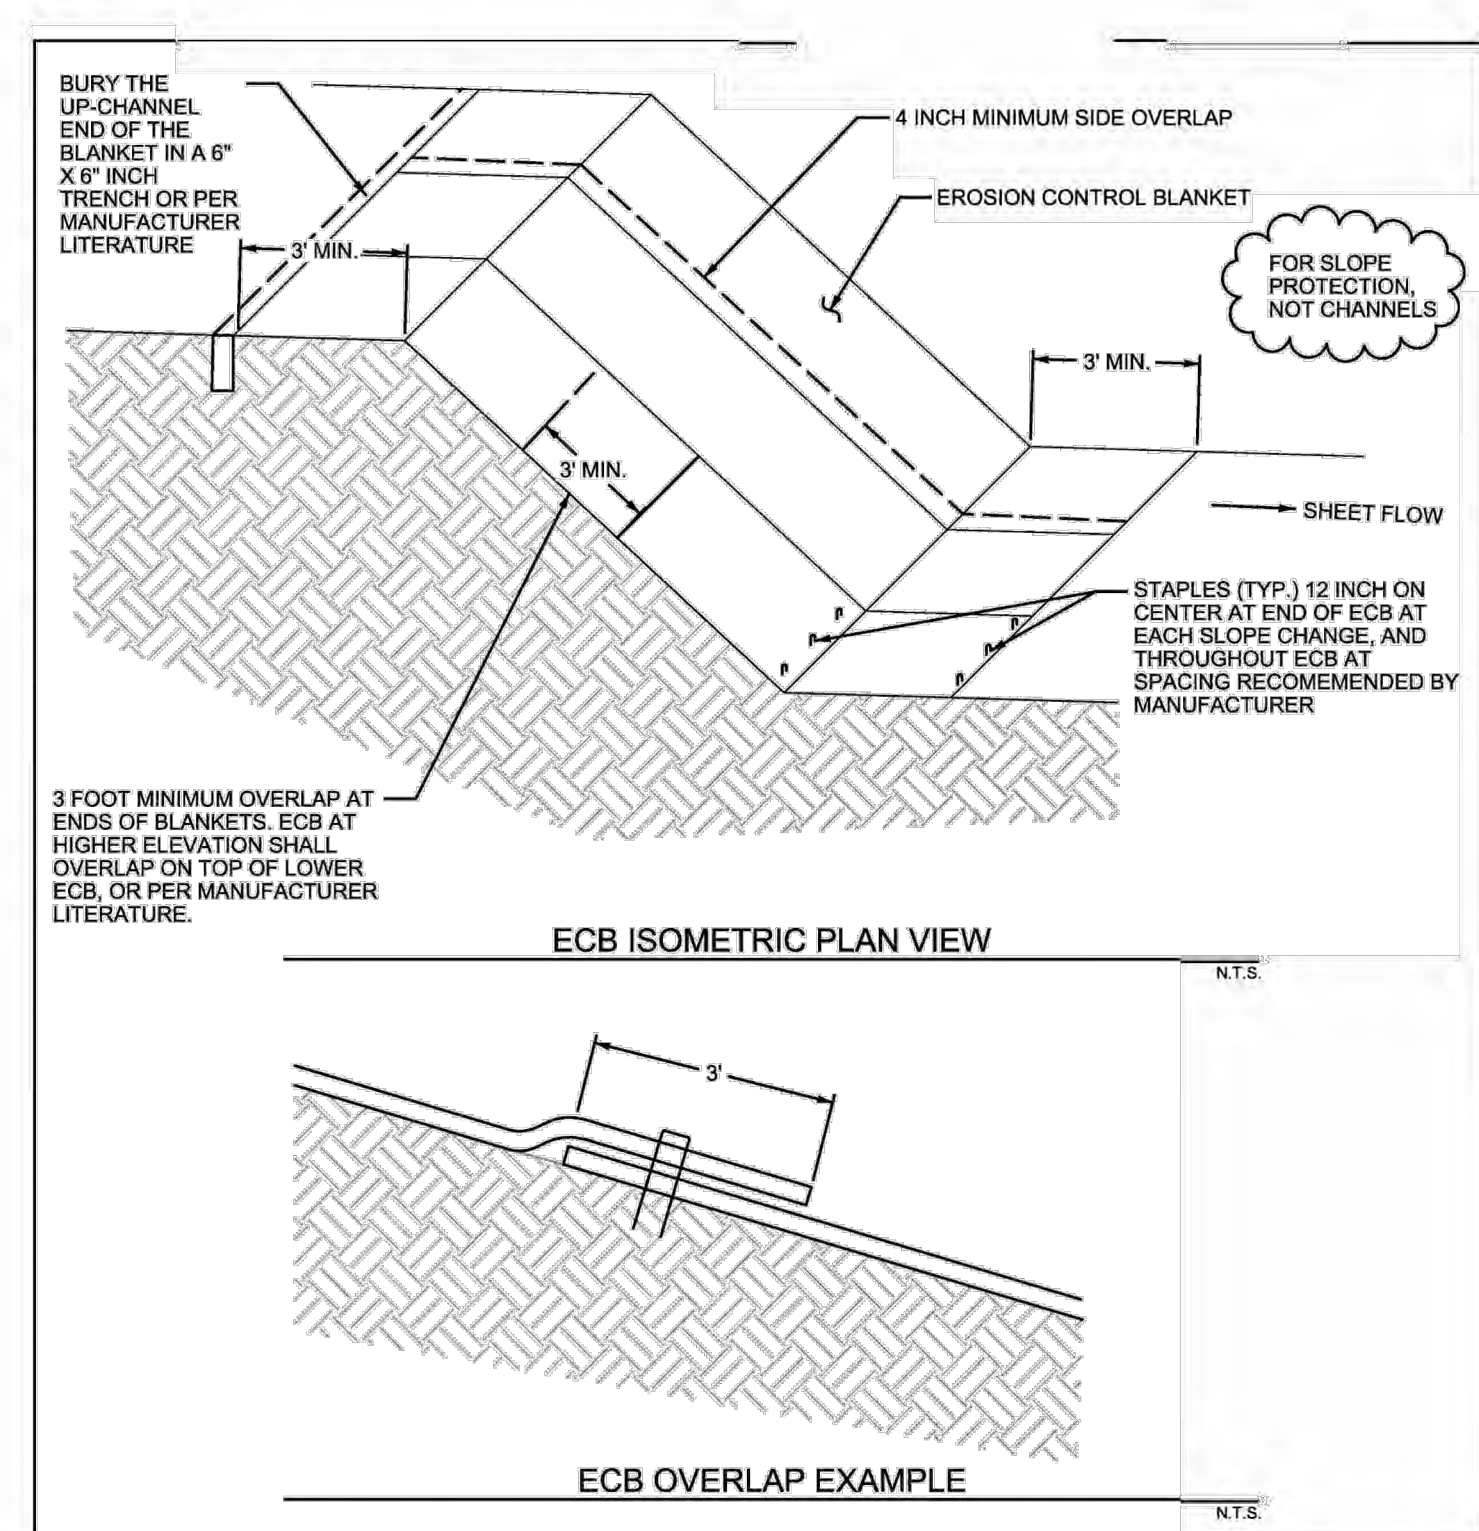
STANDARD CONSTRUCTION DETAIL -
